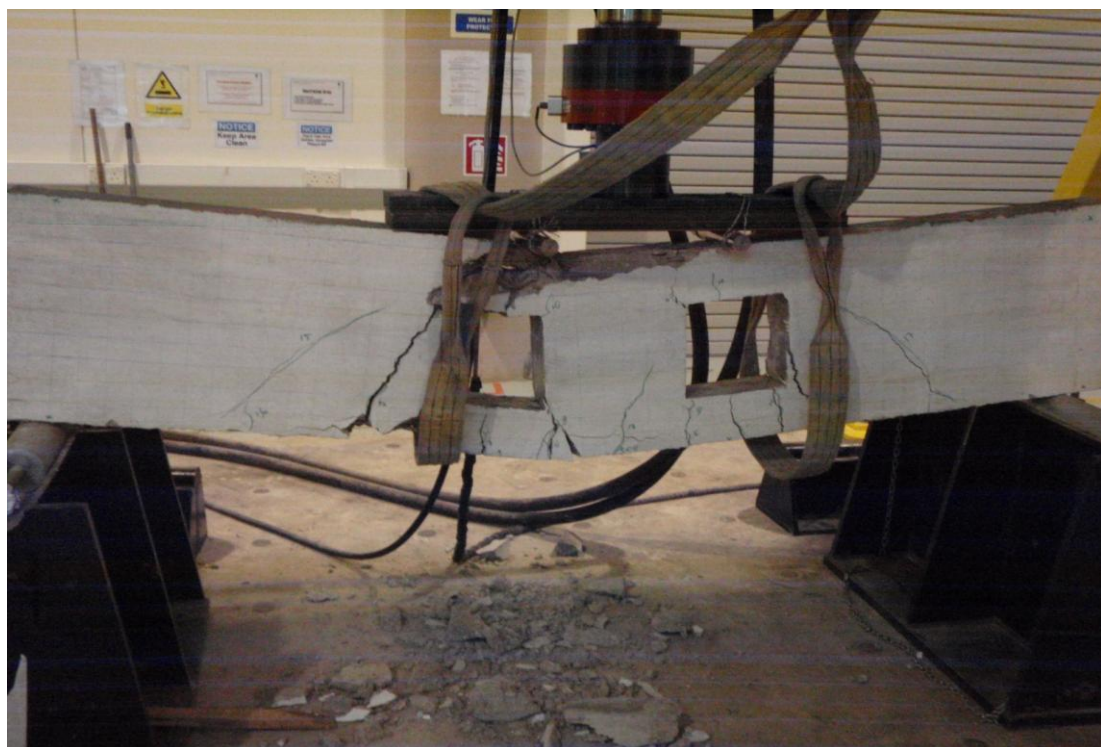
Failure Mode of Beam with Square Opening subjected to Static Load
